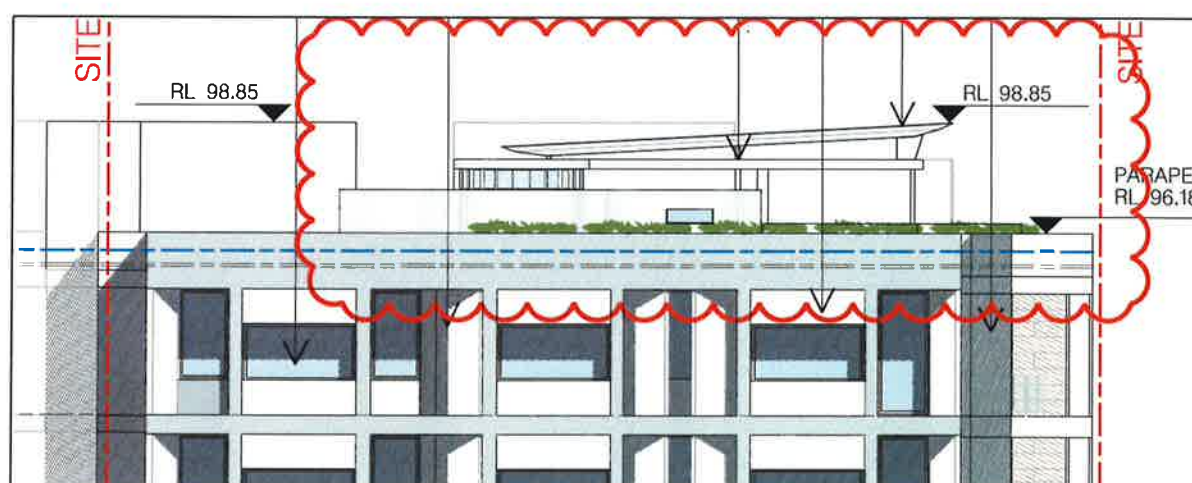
Extract from western elevation (Source: Amended MOD 5 architectural plans)
